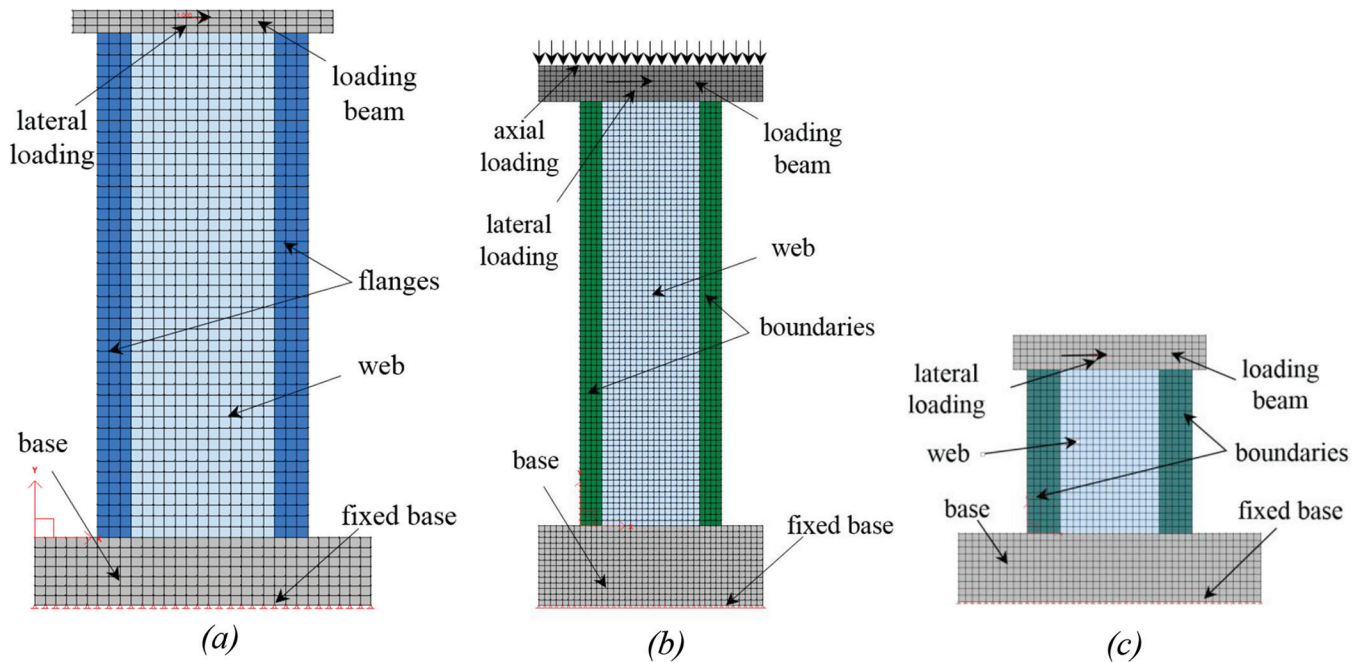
FE models of shear wall specimens: (a) Wall B2; (b) Wall RW1; and (c) Walls LSW1 and LSW2.
